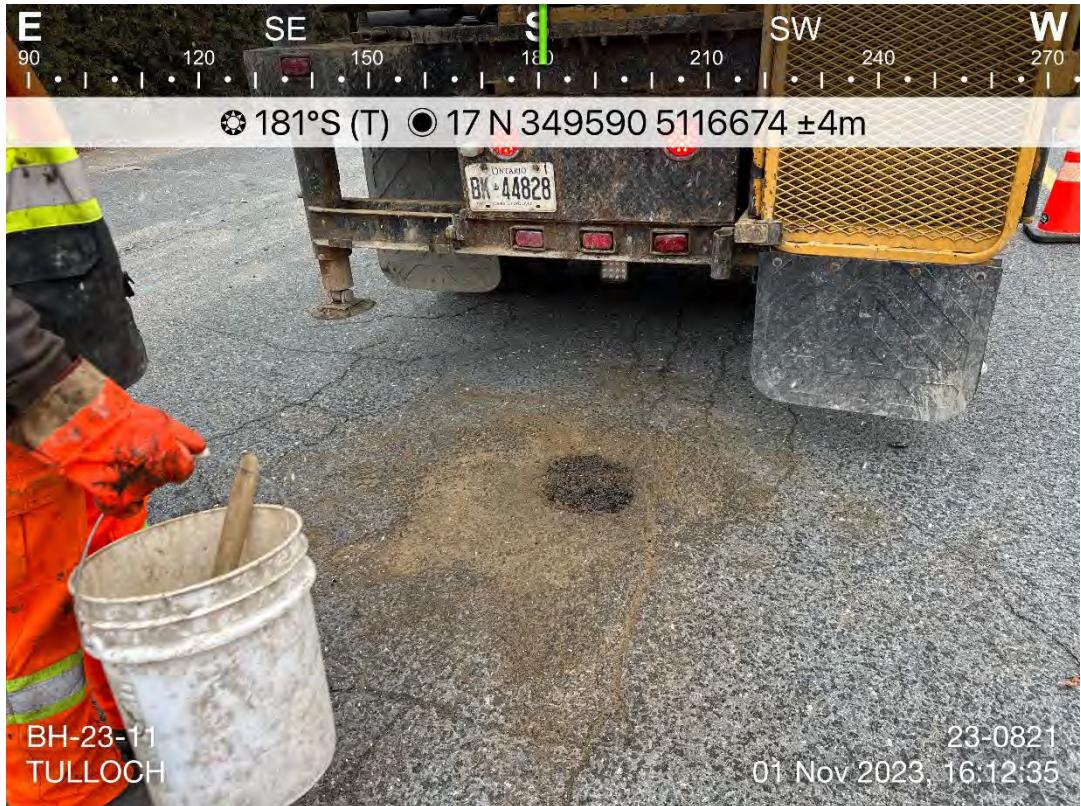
BH-23-11 following completion of backfill. Photo taken facing south.
